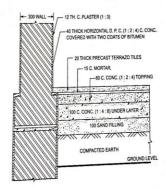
(B) PRECAST TERAZZO TILE FLOORING
